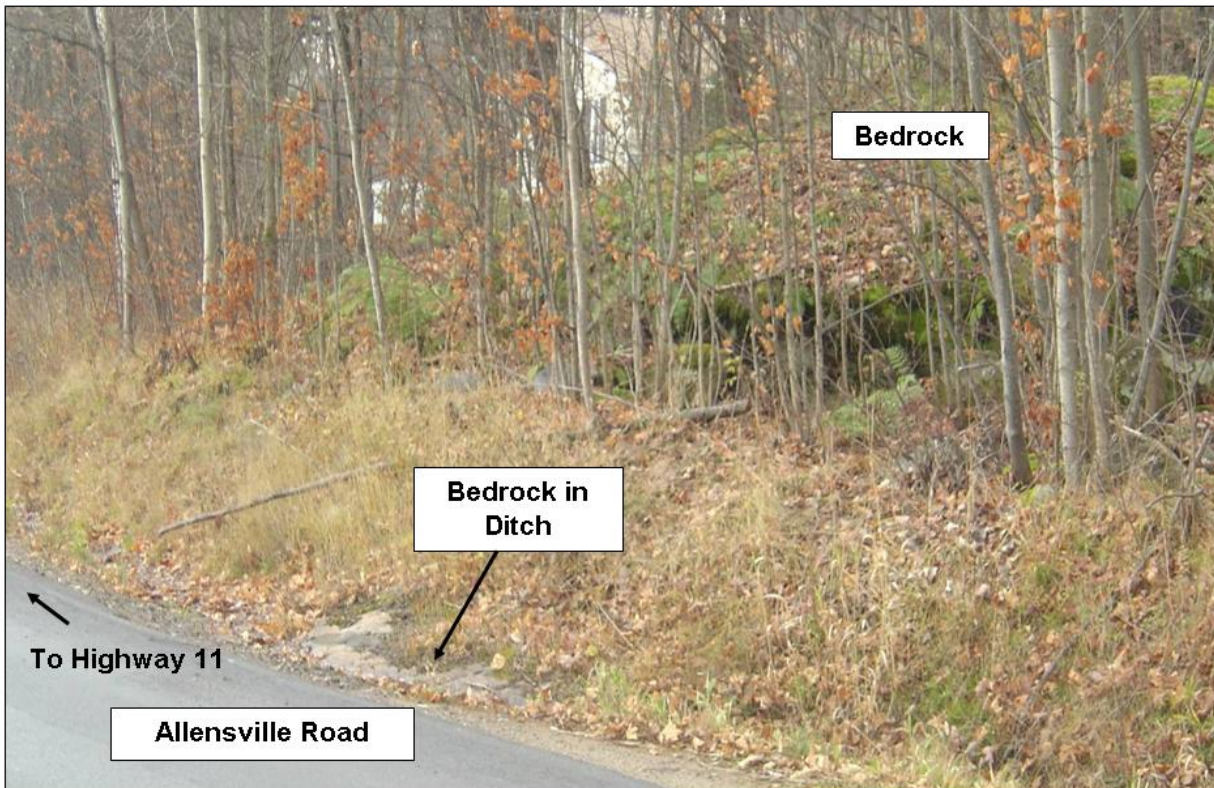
VIEW: Looking east from west shoulder of Allensville Road along Highway 11 between about Sta. 21+600 to 21+900. New Allensville Road from west (left) crosses Highway 11 with underpass structure. Rowanwood Road realigned 100 to 200 m east of Highway 11 NBL in heavily bush and swamp areas. (Nov. 2007)
